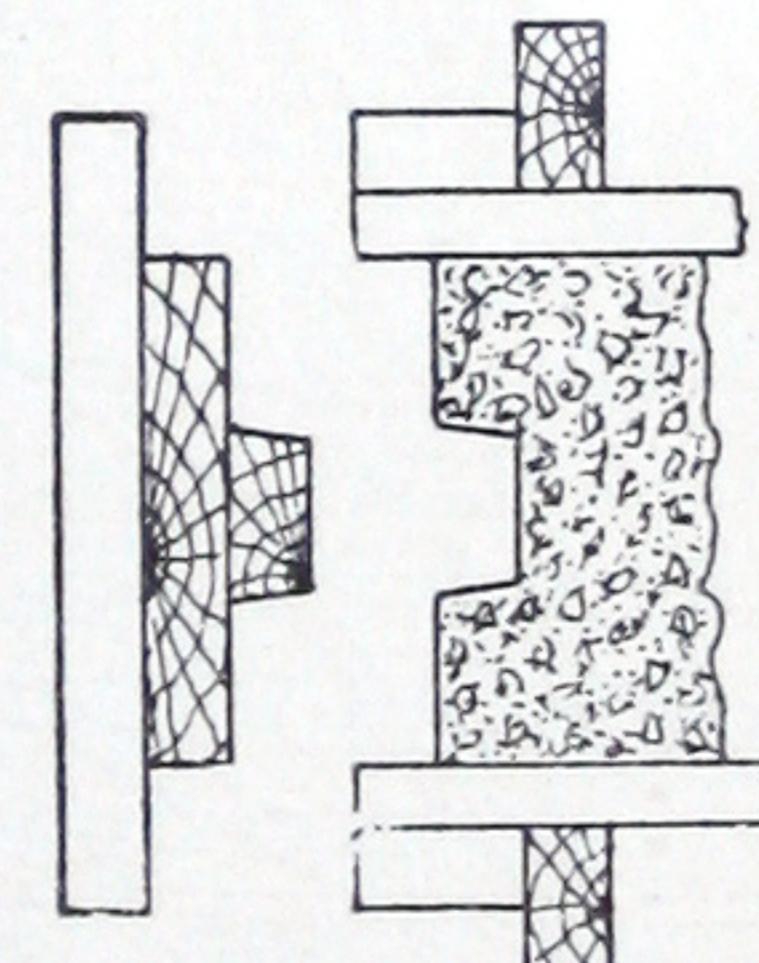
Method of joining foundation walls where it is necessary to leave an expansion joint or where concreting has been discontinued for any reason.
